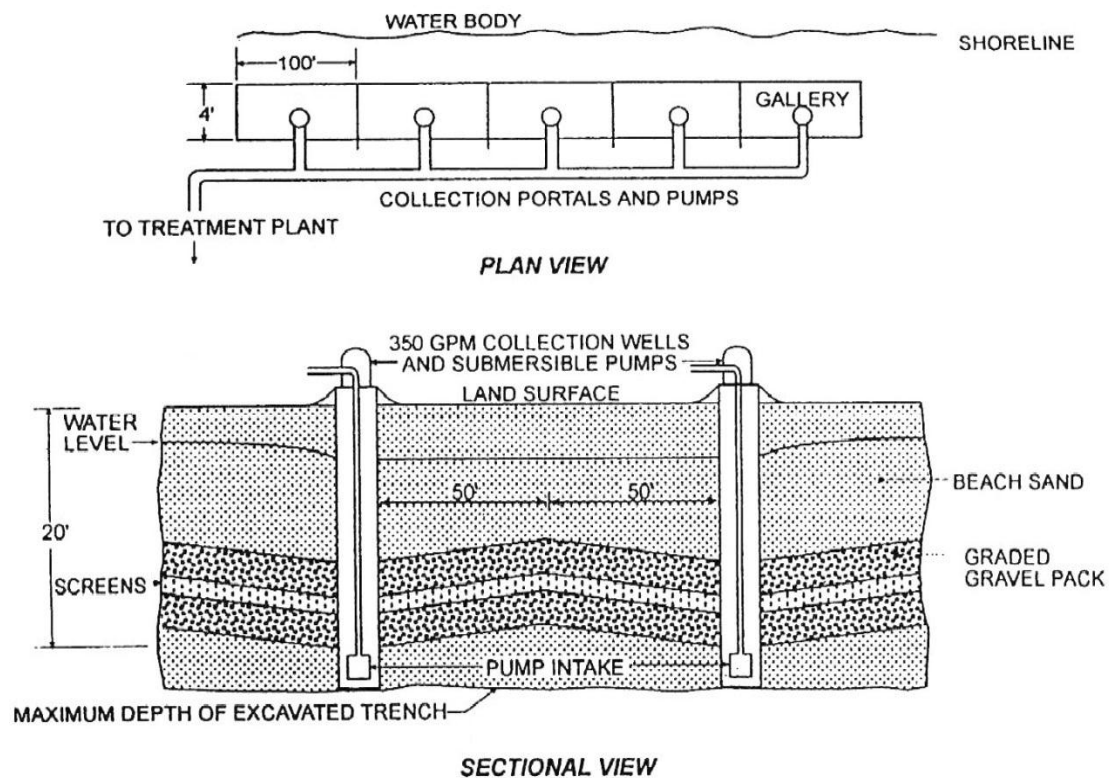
Layout and Section of a typical Horizontal Beach Gallery (Schwarz, 2000)
